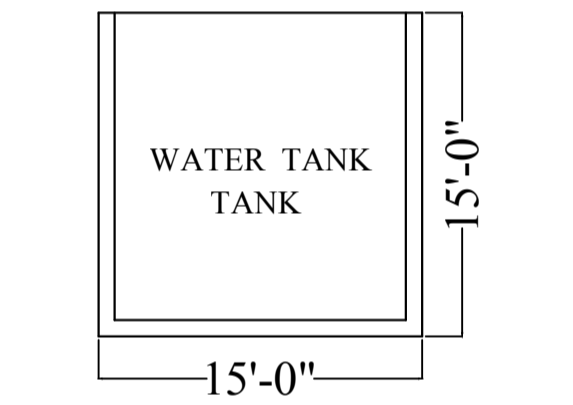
DETAIL PLAN & SECTION OF RAINWATER HARVESTING TANK
